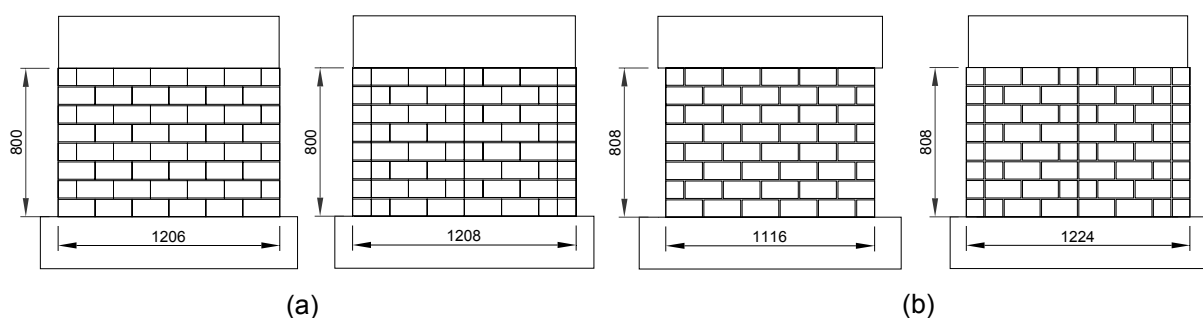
Geometry of in-plane masonry walls with distinct masonry bond patterns: (a) masonry walls built with 3-cell masonry units and (b) masonry walls built with 2-cell masonry units.
